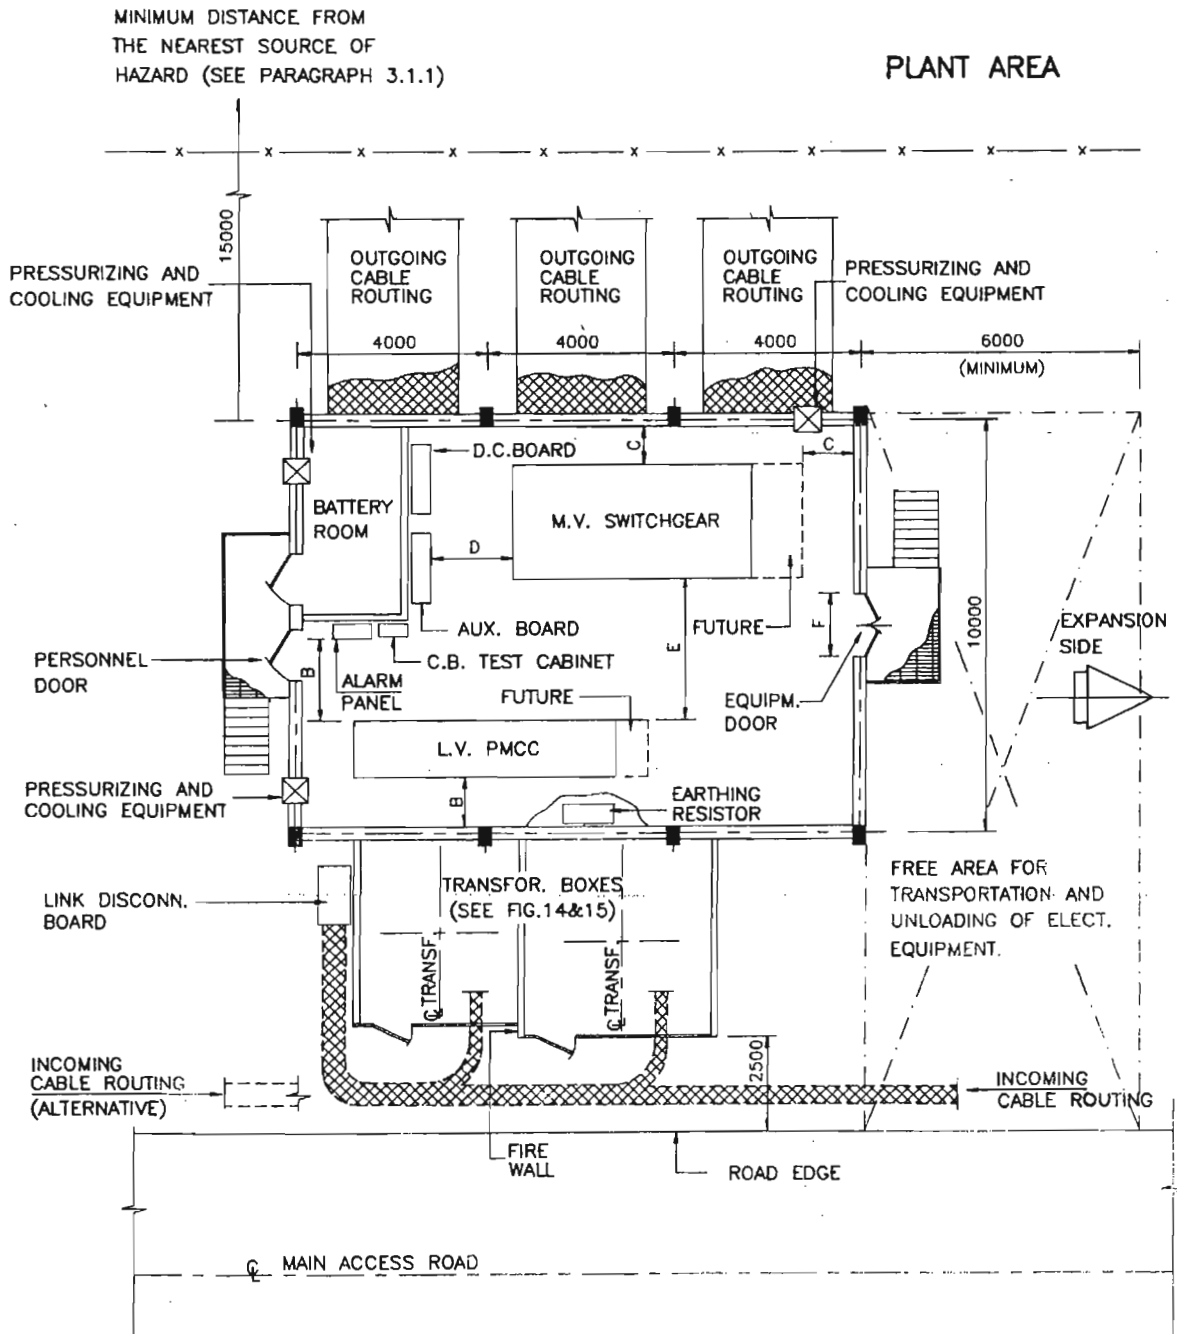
LAYOUT--L.V.& M.V. SINGLE ENDED SUBSTATION
